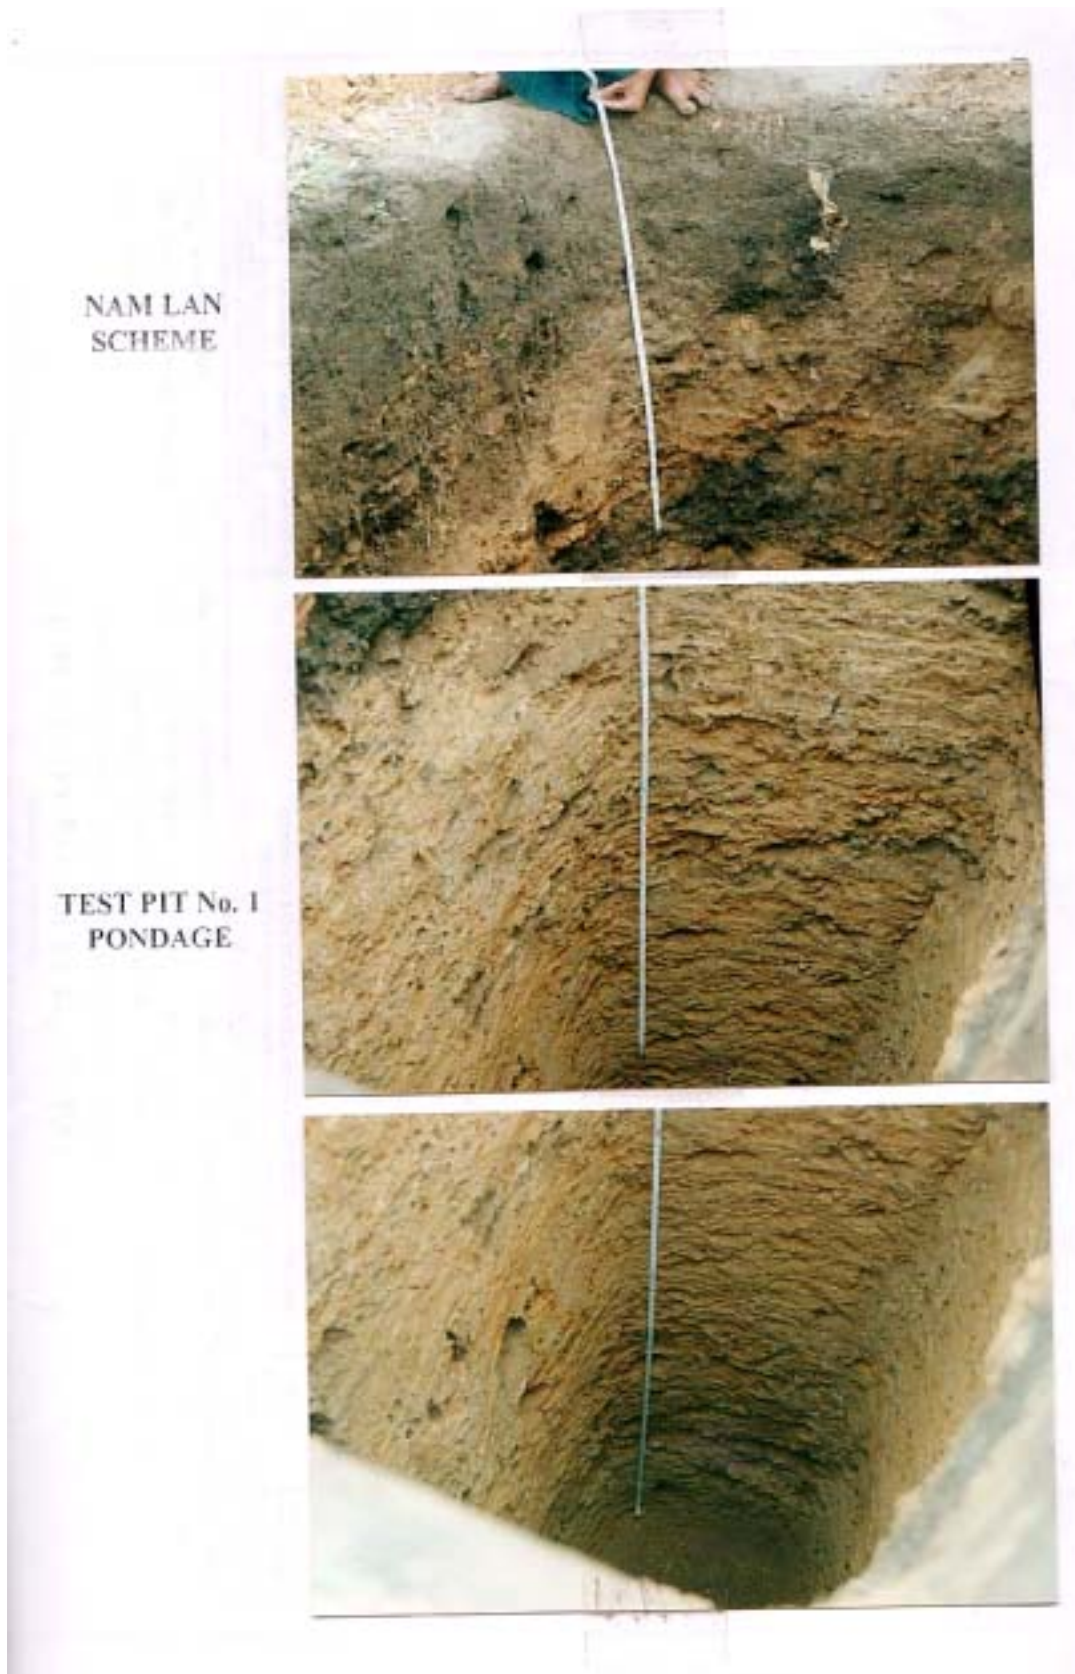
Photograph of Test Pit No.1 (2/2)
